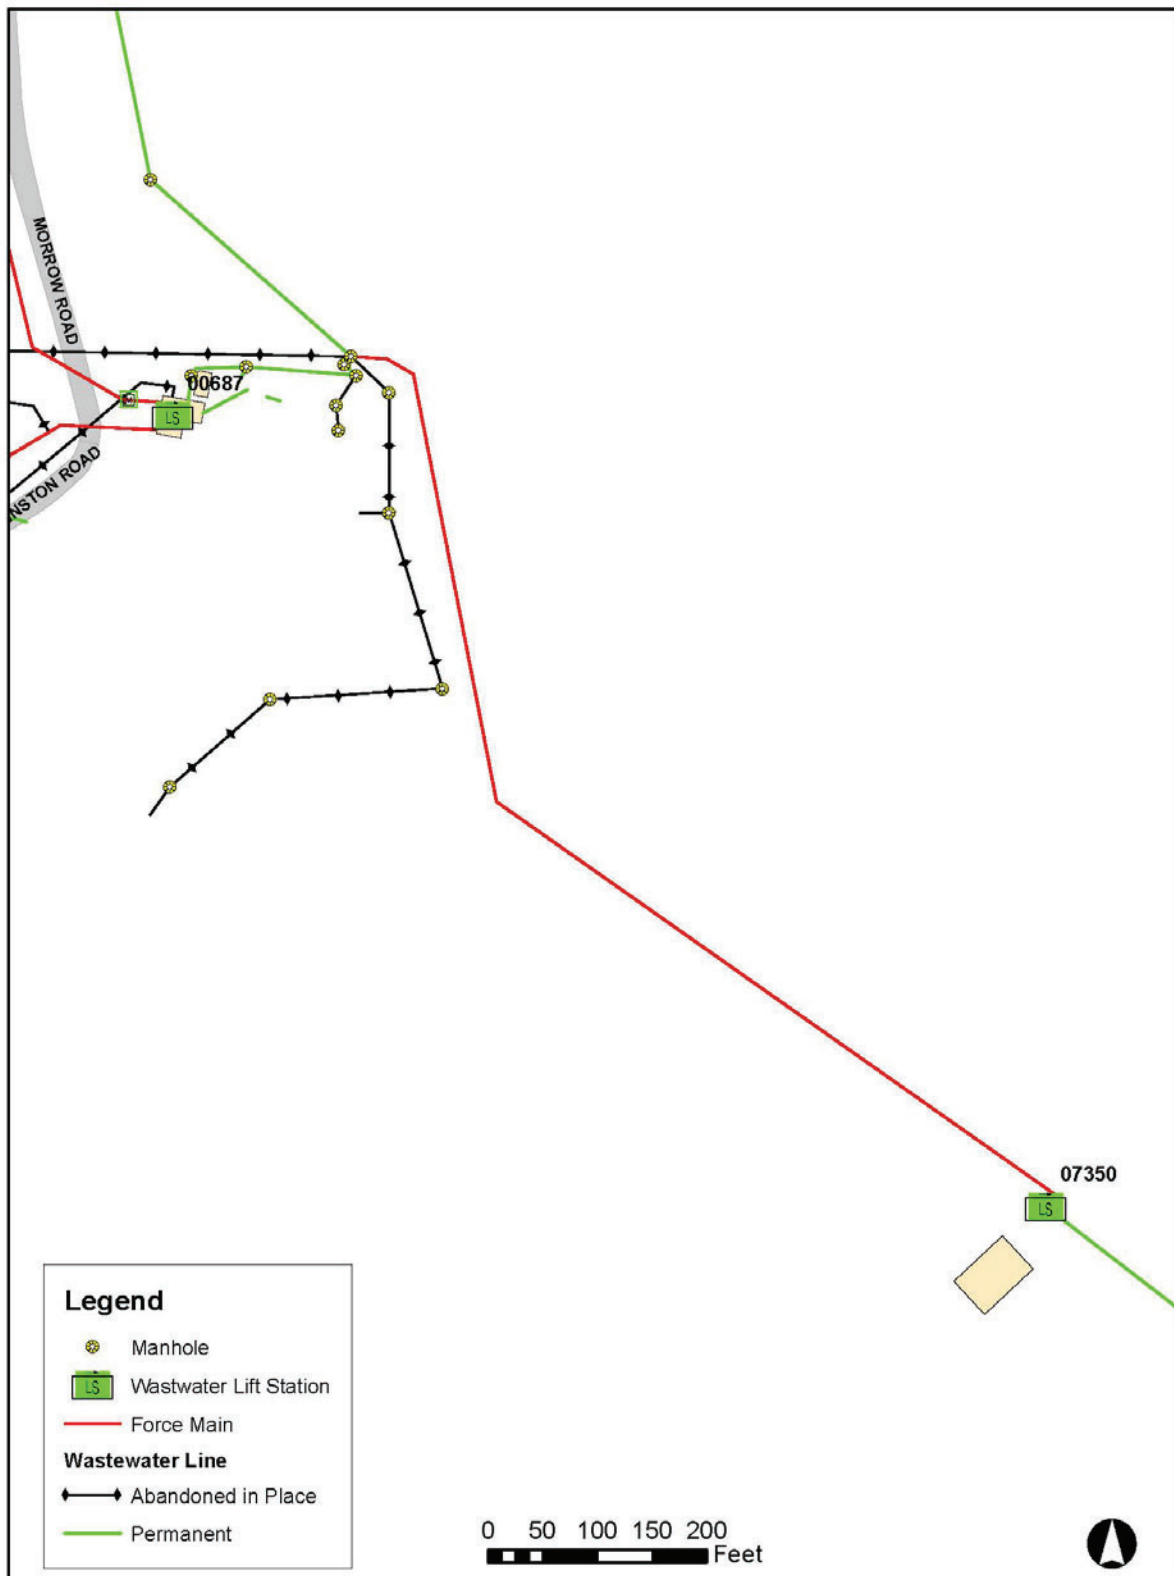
Site Design for Lift Station 7350 300 Area West to 687
